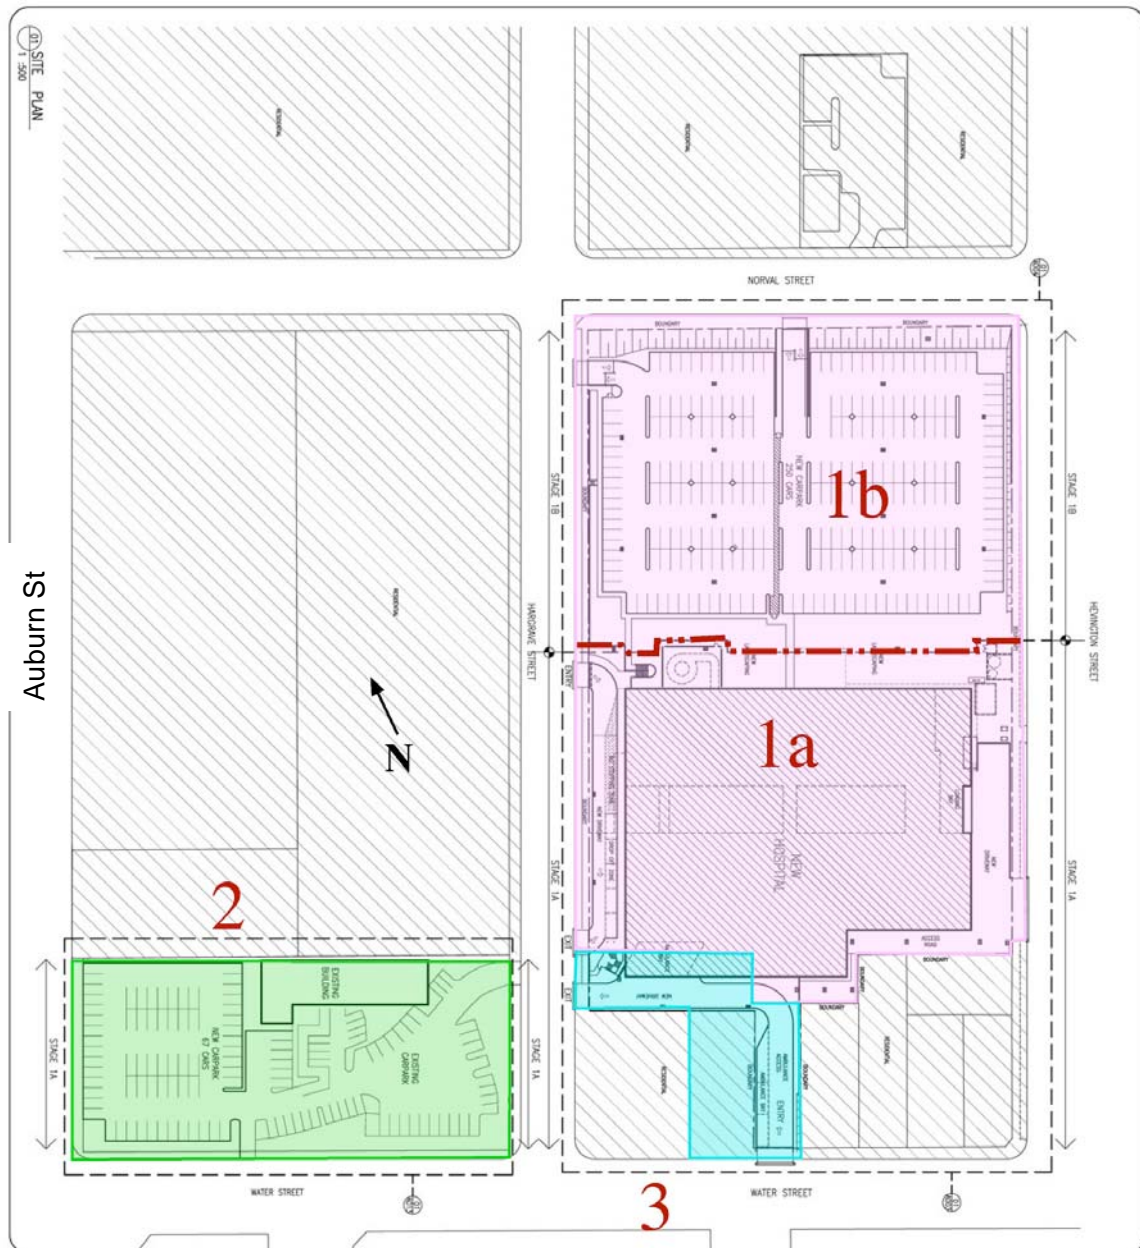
Proposed Development (Site Plan – Master Plan. Suters 8731_A-002.dwg. June 2006).
